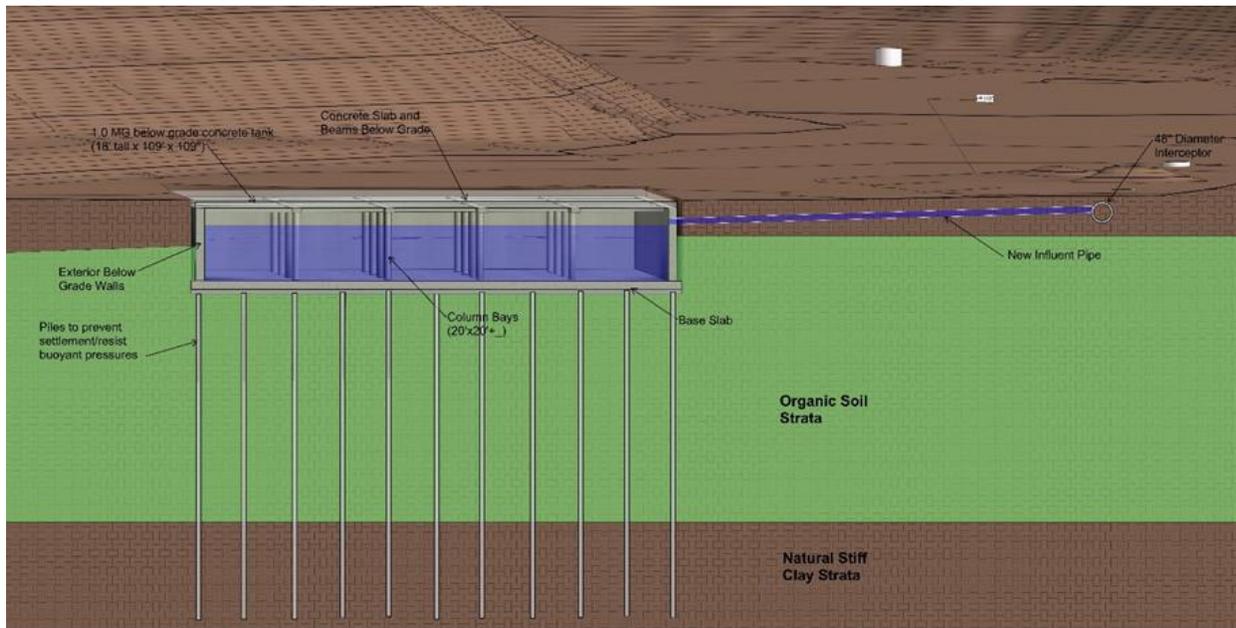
Example of a Below Ground Cast-in-Place Concrete Storage Tank
